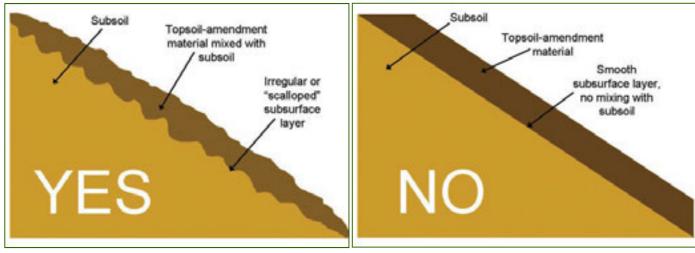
Topsoil amendment applied and mixed with subsoil, creating a "scalloped" subsurface layer (left). Typical topsoil-amendment application without mixing with subsoil (right).
